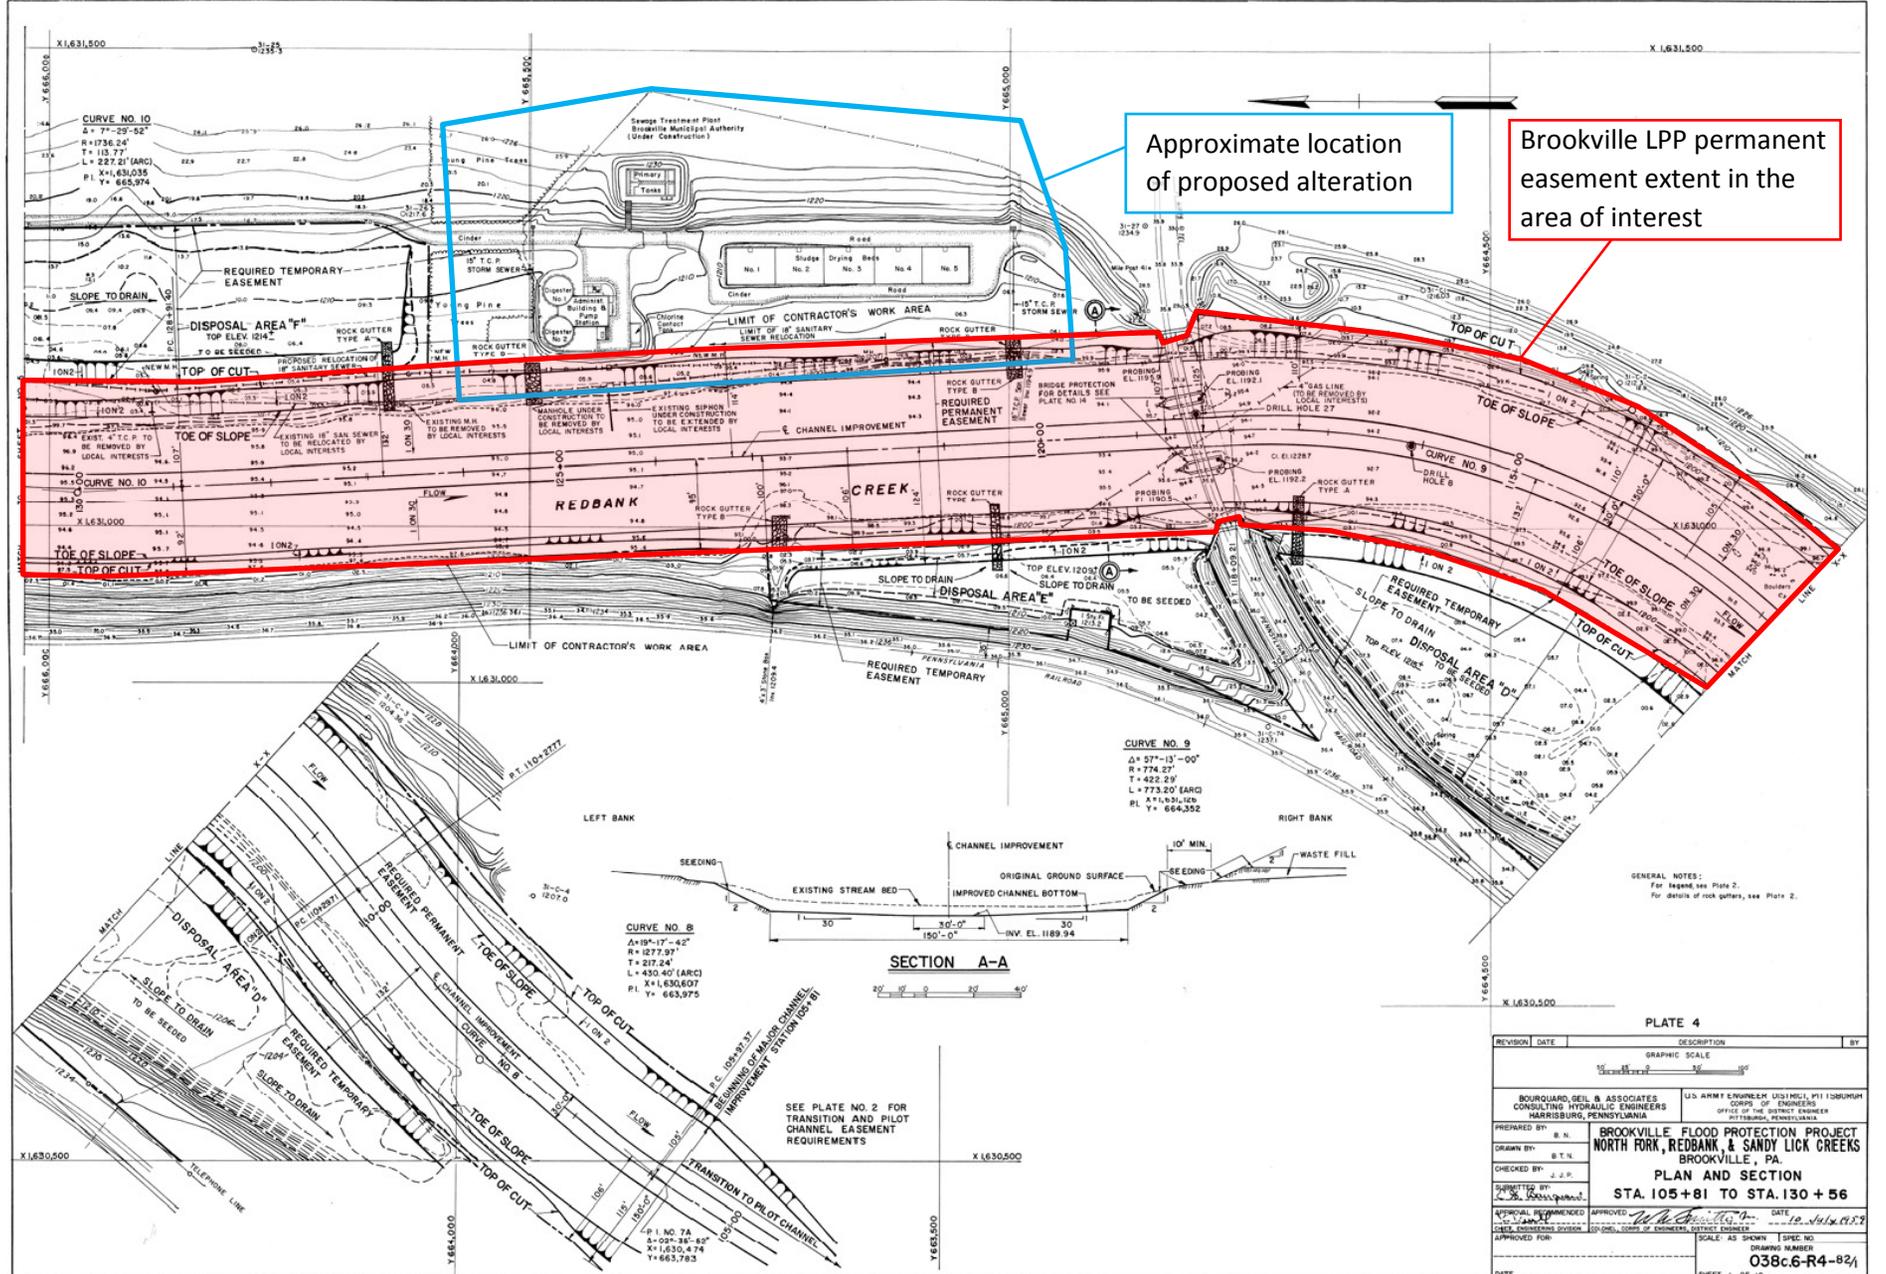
As-built plan for the LPP at the proposed alteration existing site.
